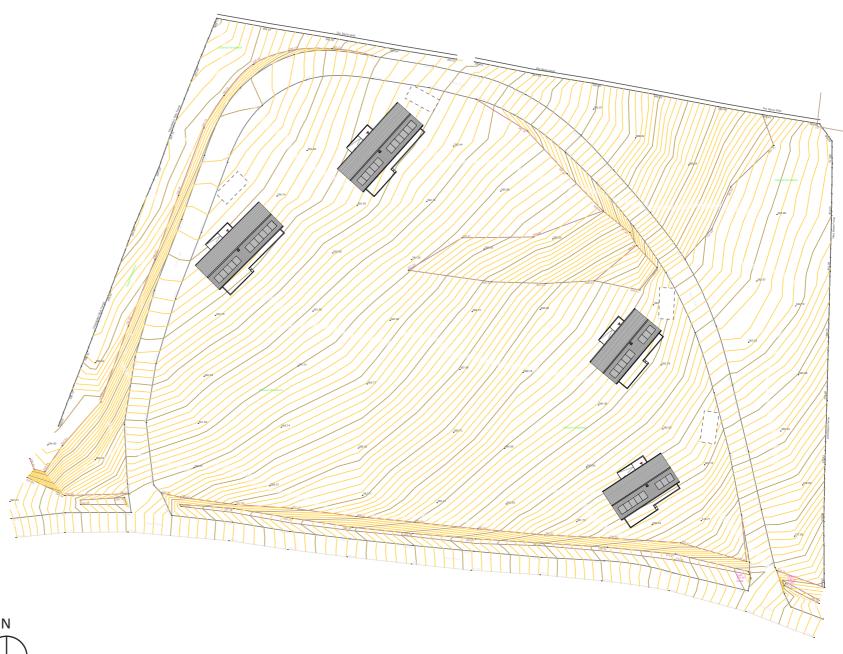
Proposed Site Plan depicting location of 4no. lodges. NOT TO SCALE
